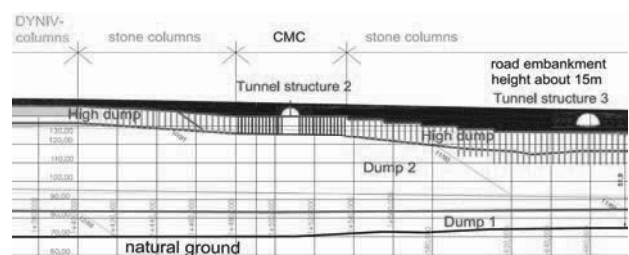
Design section of the tunnel structures crossing the up to 15 m high embankment over the landfill
